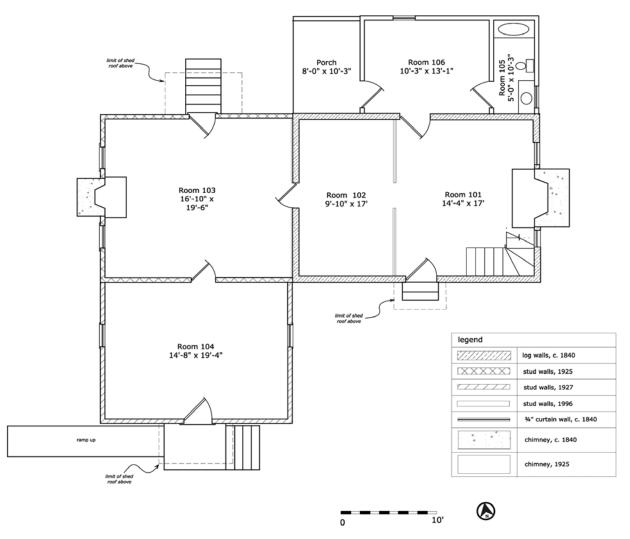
Floor plan of existing Power-Hyde House. T. Jones, NPS, 2010)
